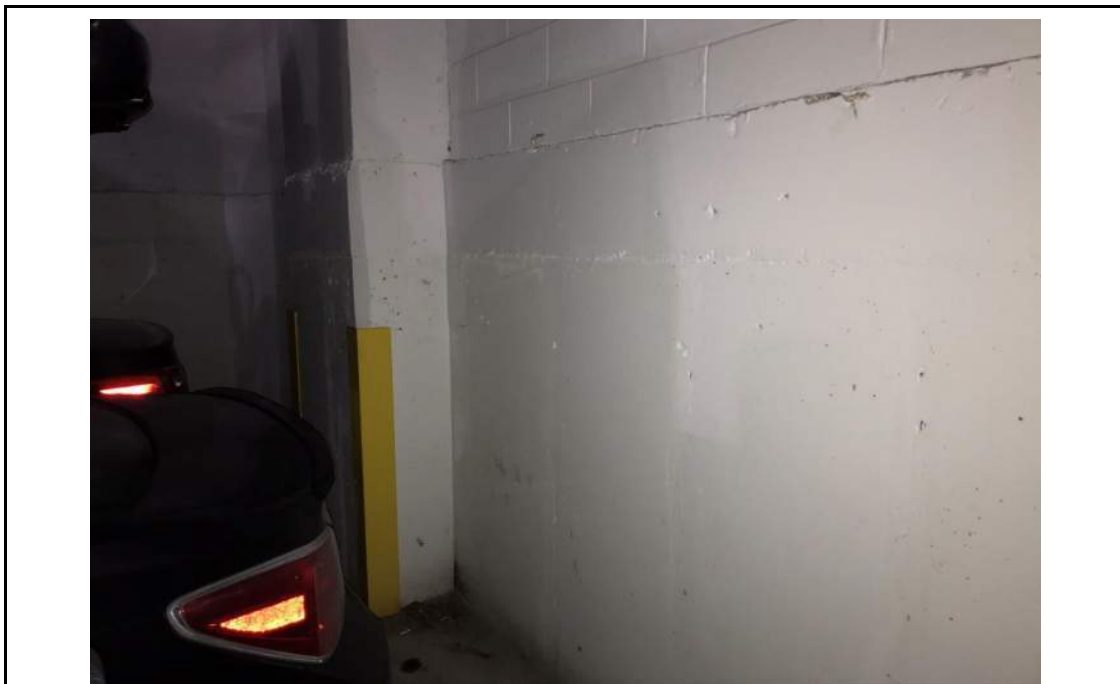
Subgrade parking lot concrete foundation wall (beneath the first floor), facing southwest. 6 February 2020.
